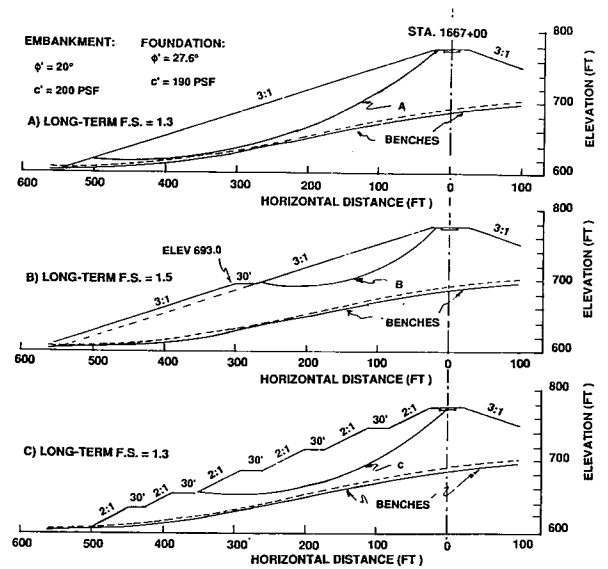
Cross Section of Embankment Located at Station 1667+00.
